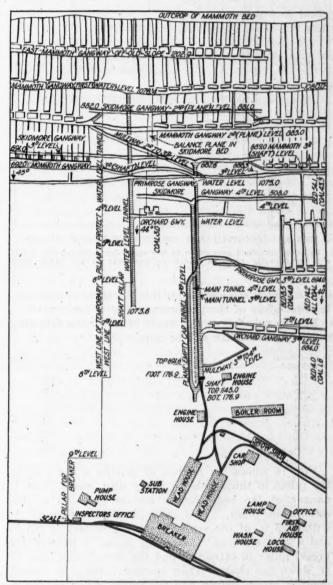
PLAN OF A SHAFT PILLAR LEFT FOR SURFACE SUPPORT
